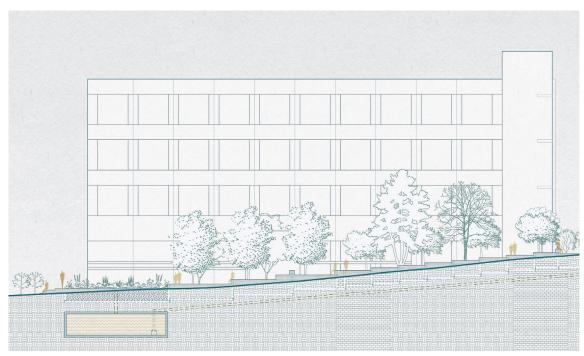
Stores lower greenspace detail - Section. 2022, by author. (not to scale on a 8.5x11 sheet)
